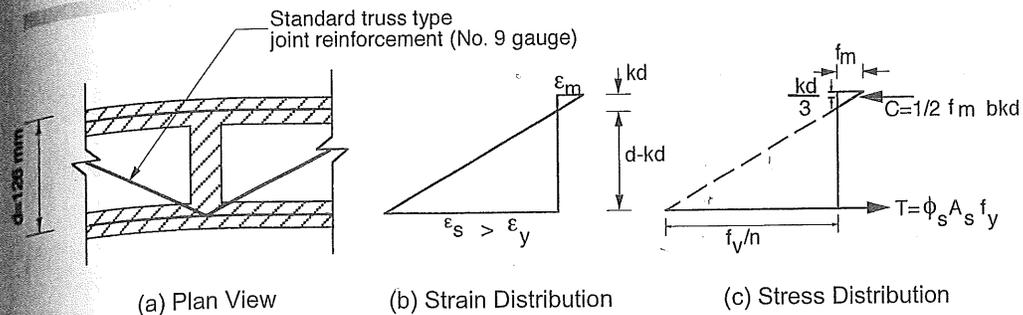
Reinforced masonry wall spanning horizontally for Example 6.5.
